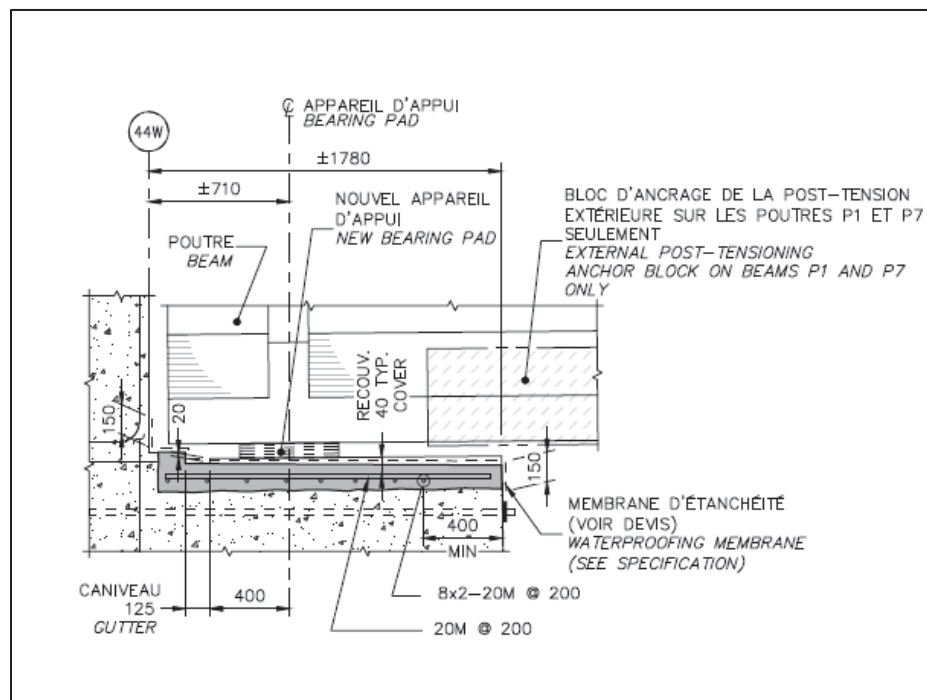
Section view of abutment 44 west of the original CHB from the bearing seat reconstruction drawing provided by JCCBI
